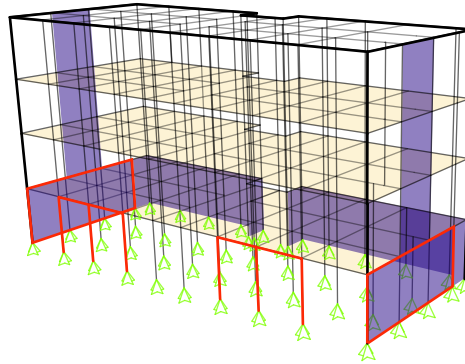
Retrofit 9: Addition of Moment Frame at Facade of Garage and Oriented Strand Board on Lateral Walls.
